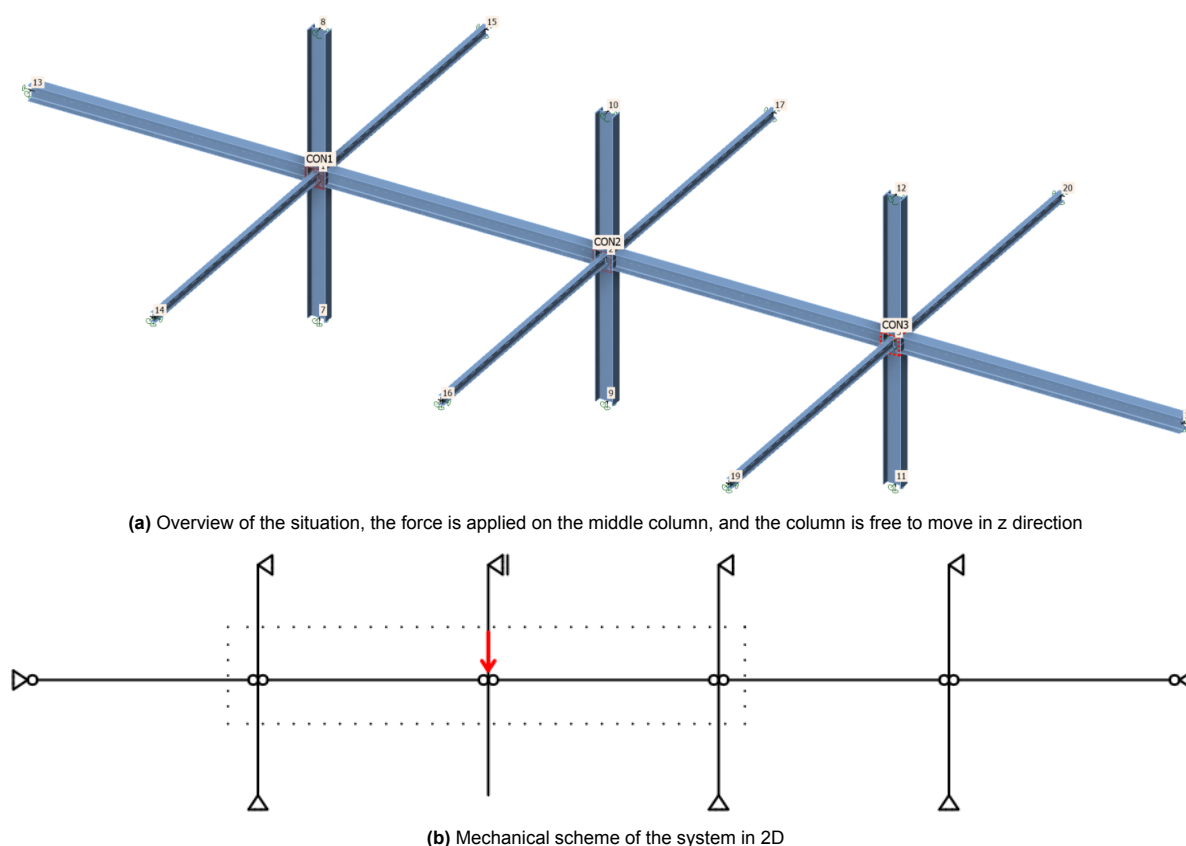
Beam and column system for a 7.2-meter span and hinged connections scenario. A load is applied on the middle column
